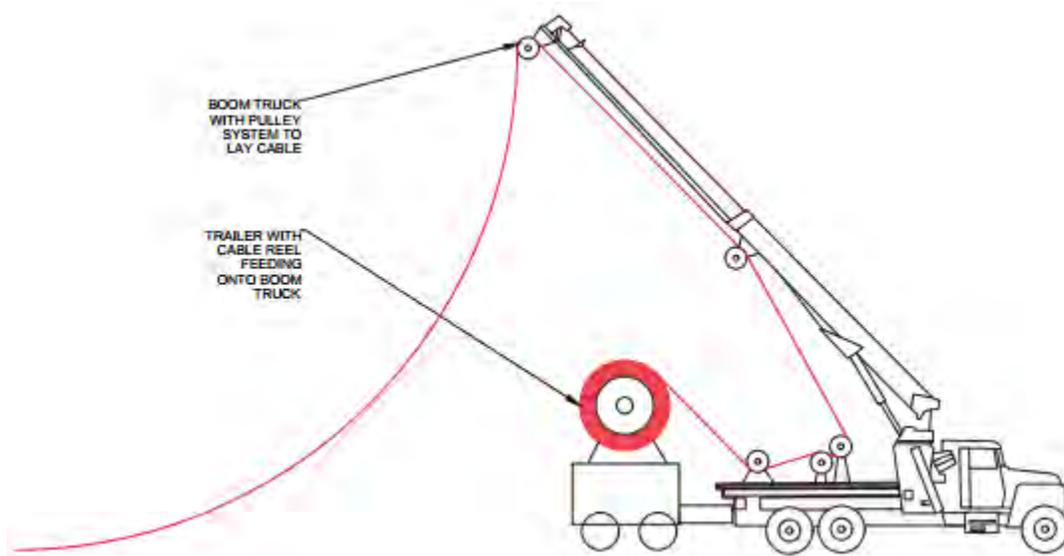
Typical Boom Truck and Equipment Used for Surface Lay
